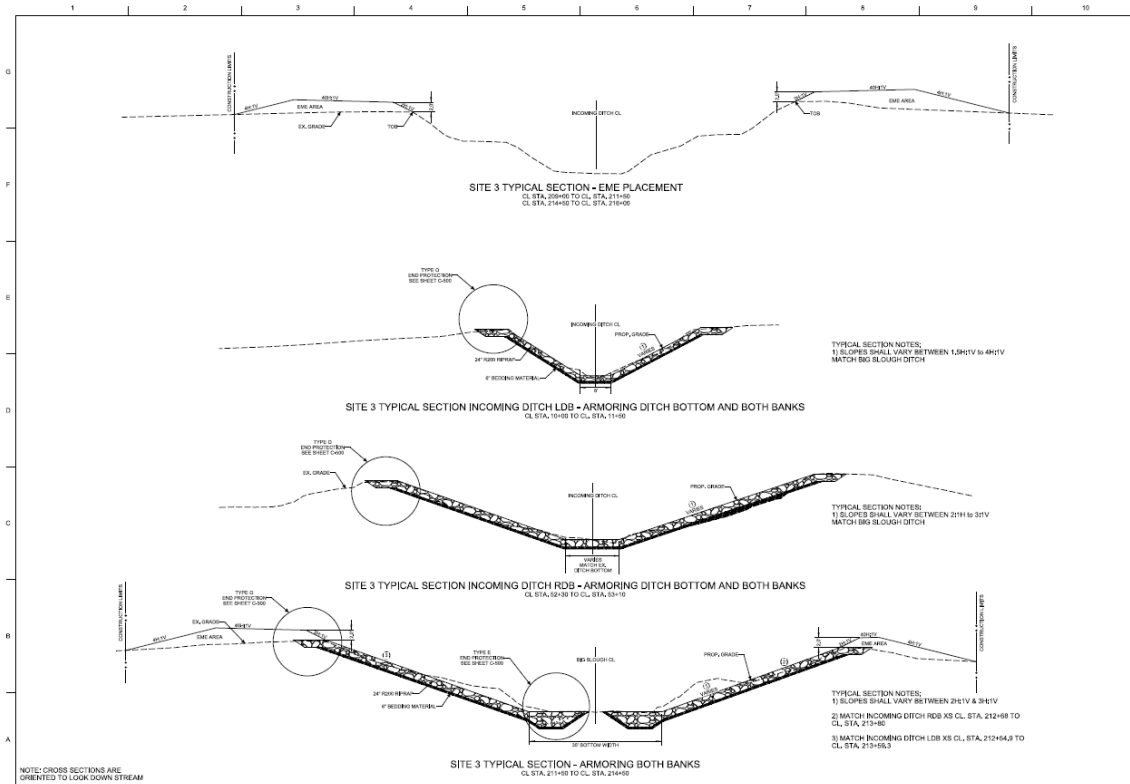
Typical proposed repair section for scours in Big Slough Ditch, Clay County, AR.
